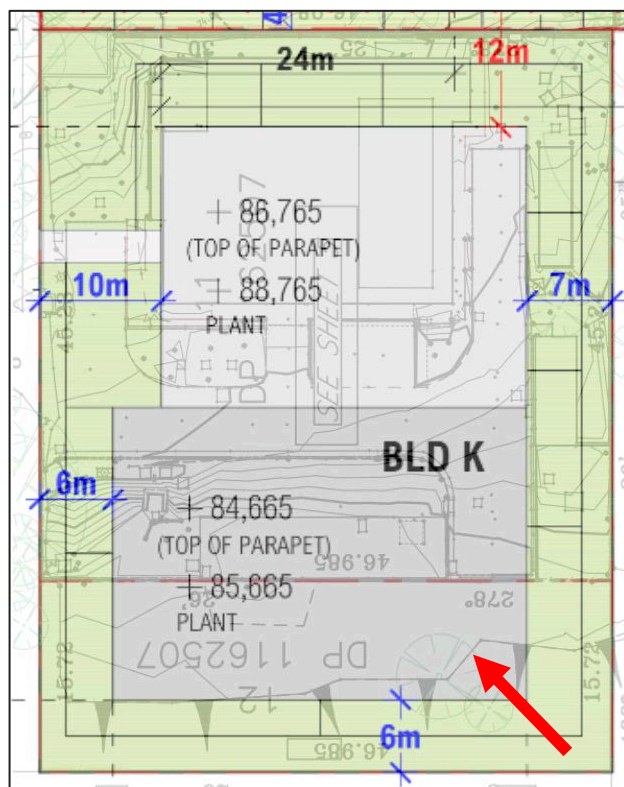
| Site survey Plan overlaid with building envelope plan indicating possible line of embankment (Base image source: site survey and SRTS plans)
